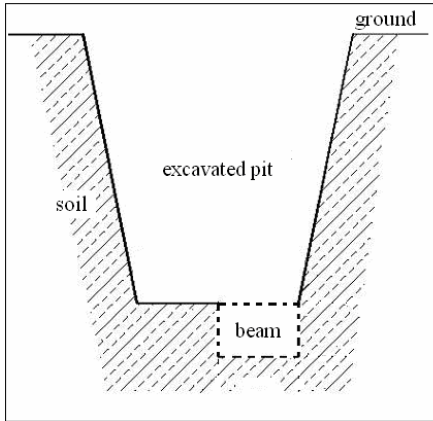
Buried Concrete Beam with FBG Sensors in Soil
